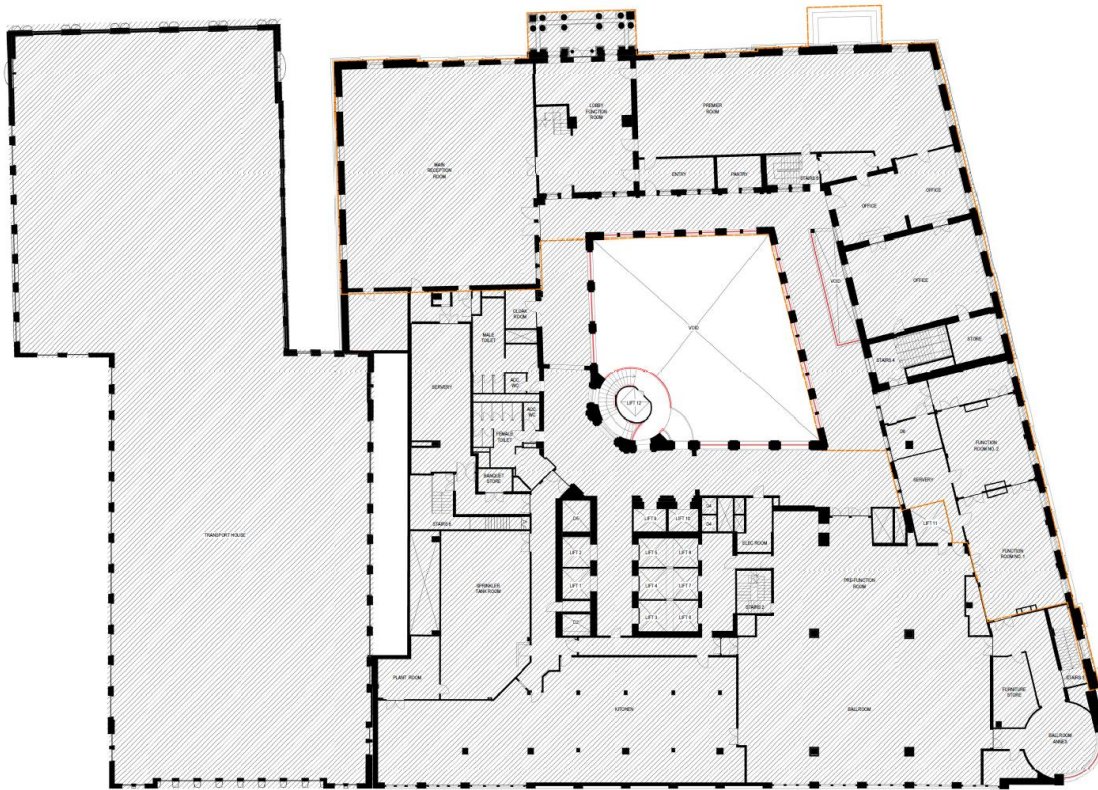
Extract of proposed plans – demolition plan level 07 (first floor)
